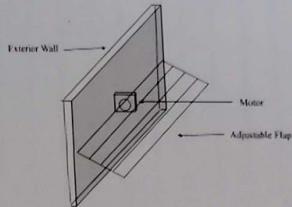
Close-up of Adjustable Flap System. Shows the motor, which would rotate to adjust the flap. Both the motor and flap would be attached to the exterior wall, which an incision made in the flap to allow the motor to pass through. This system would be replicated for all six flaps.
